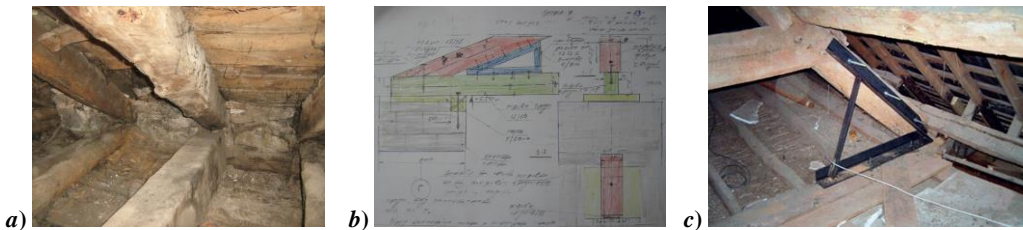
,b,c,d. Connection between floor and roof beam using steel triangle
